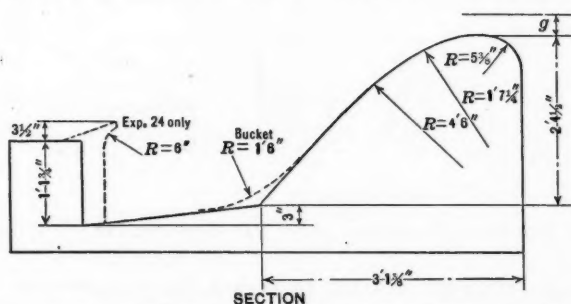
DETAILS OF MODELS FOR MISCELLANEOUS TESTS, PIT No. 4 DAM.
